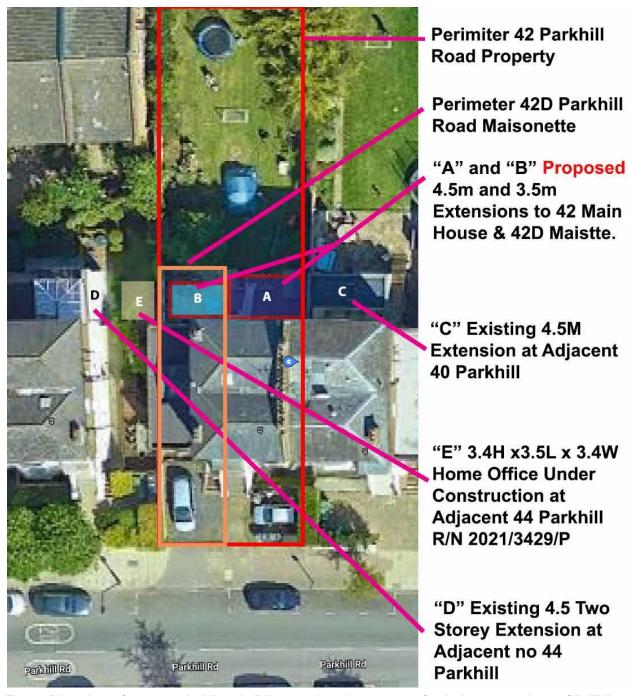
Plan view of proposed "A" and "B" extensions in context of existing extensions "C", "D"and home office "E" at adjacent nos 40 and 44 Parkhill Road
